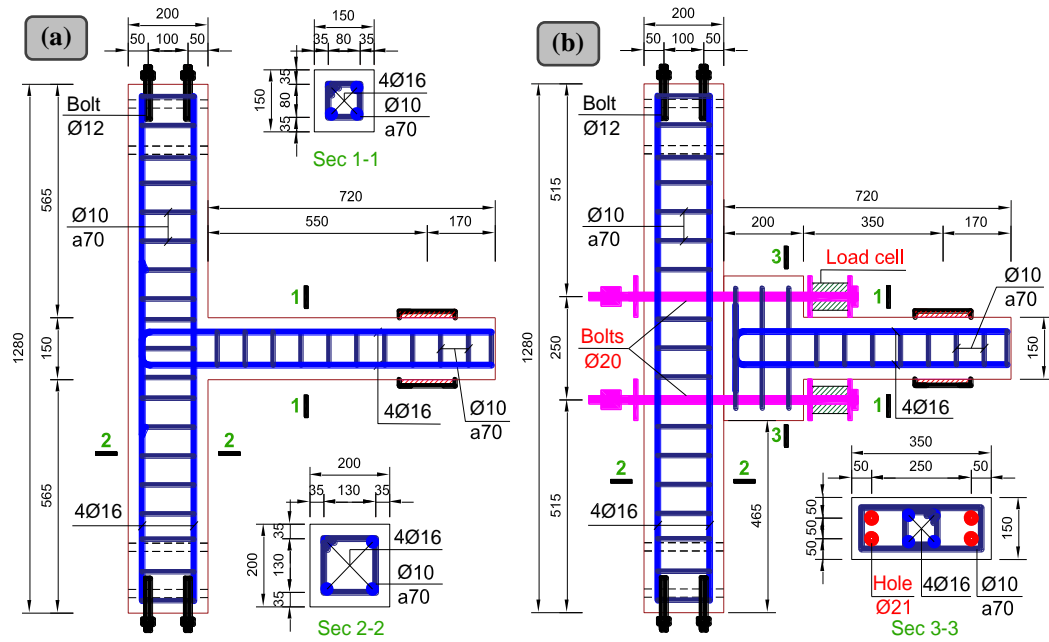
Design of (a) monolithic joint and (b) dry joint (unit: mm).
